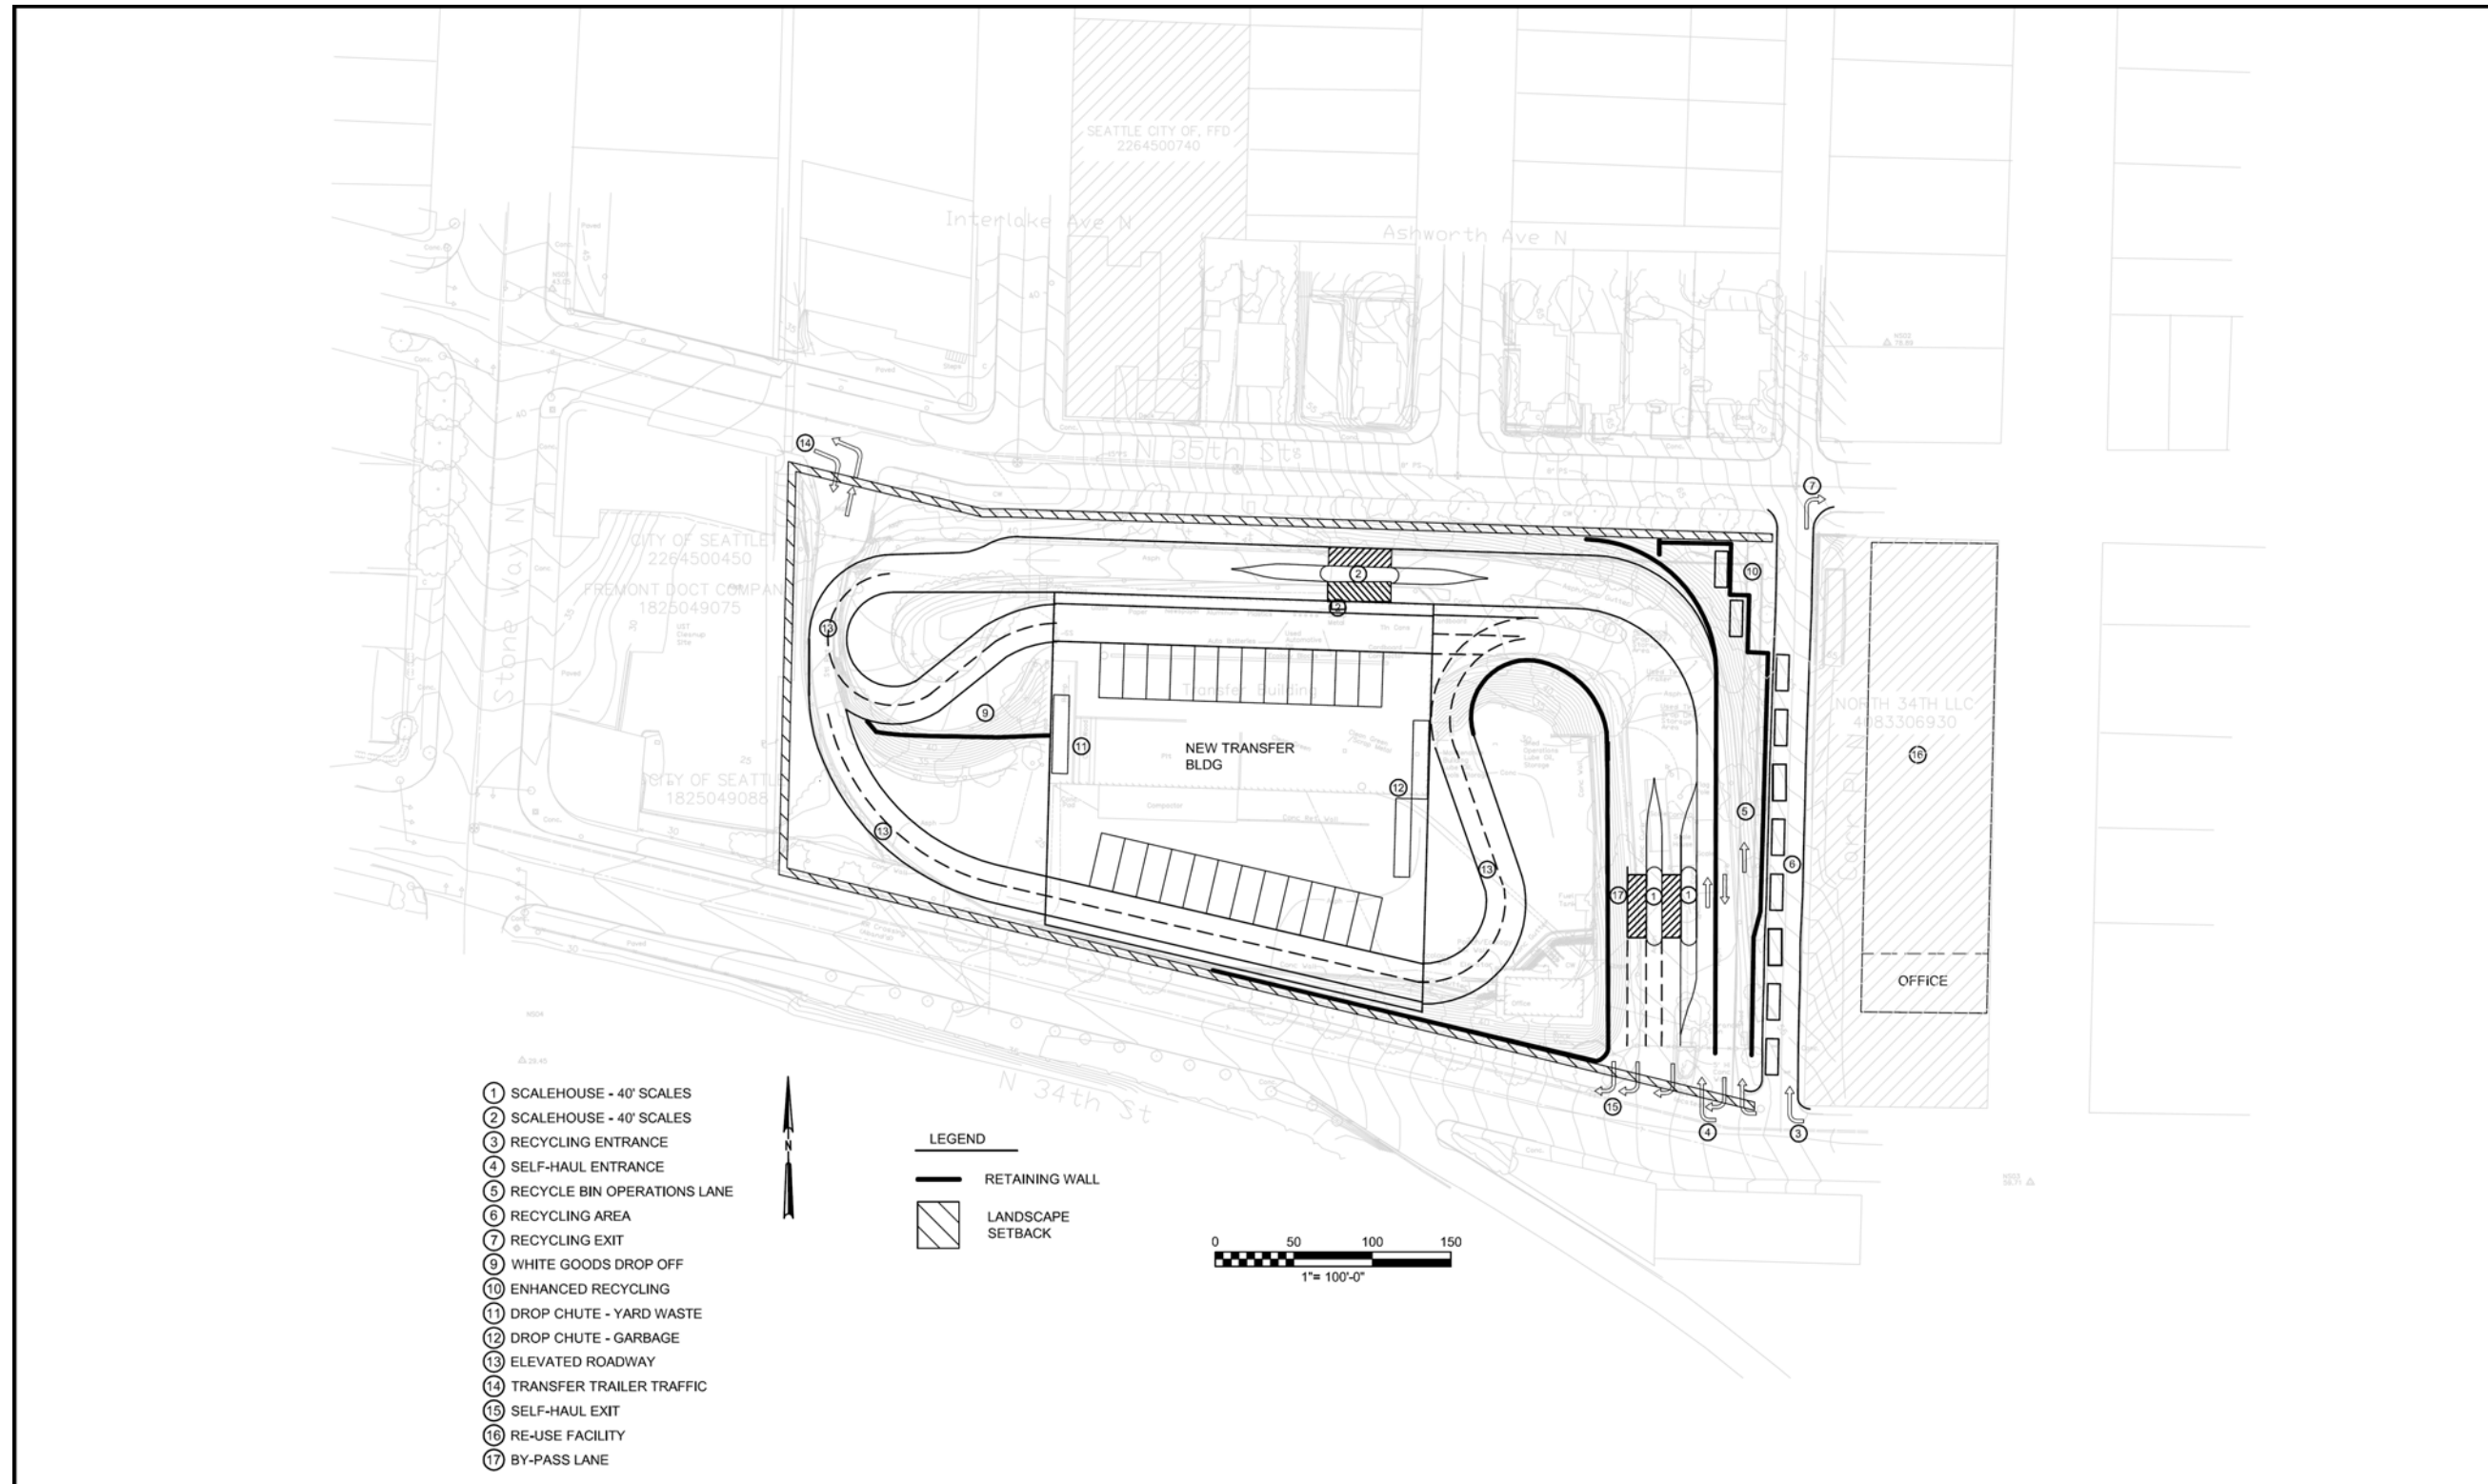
Intermodal Facility Corgiat Site Plan Option 16
